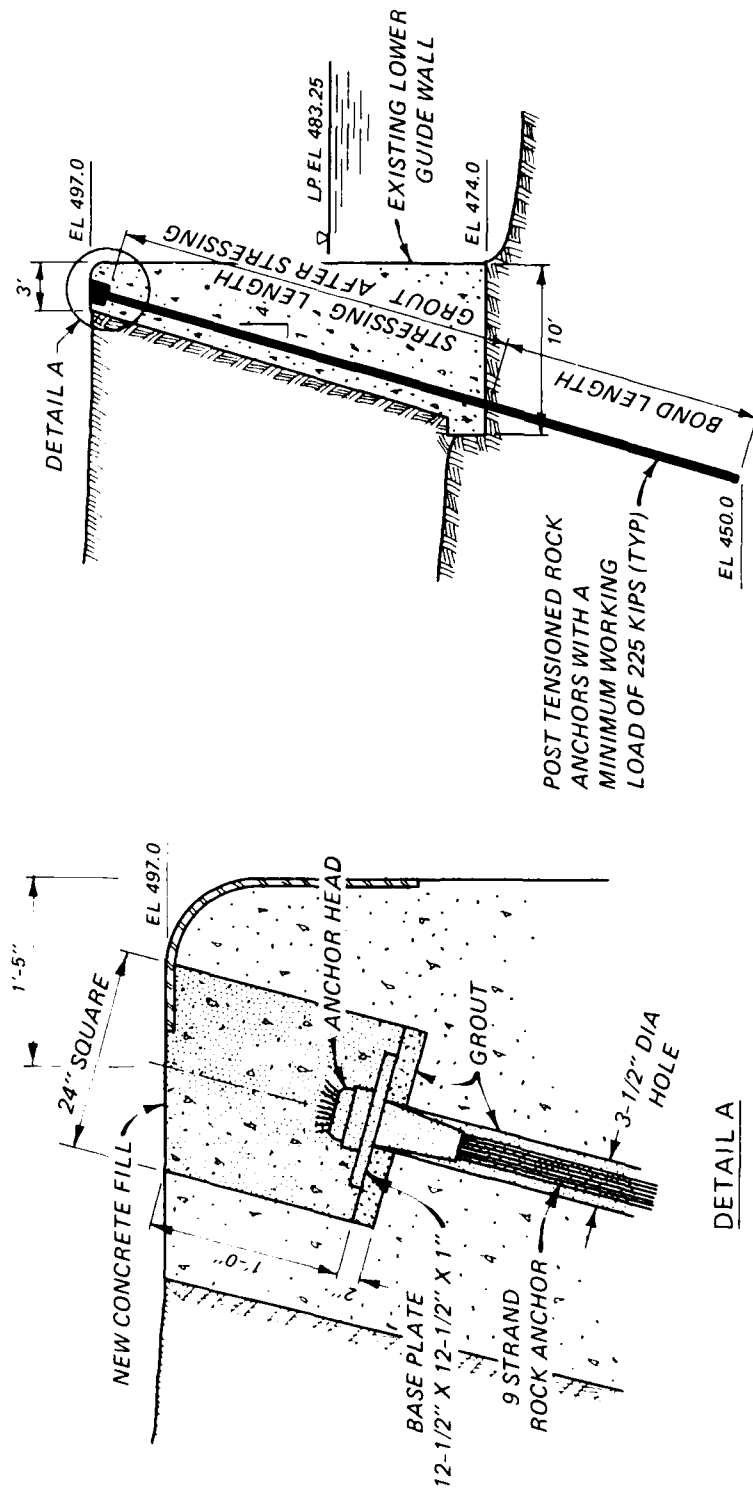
Lower guide wall stabilization, Dresden Island Lock
